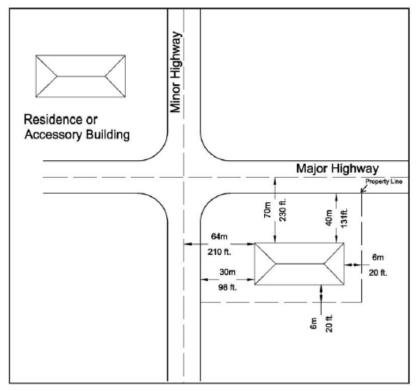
Setback for Dwellings & Accessory Buildings from Highways
